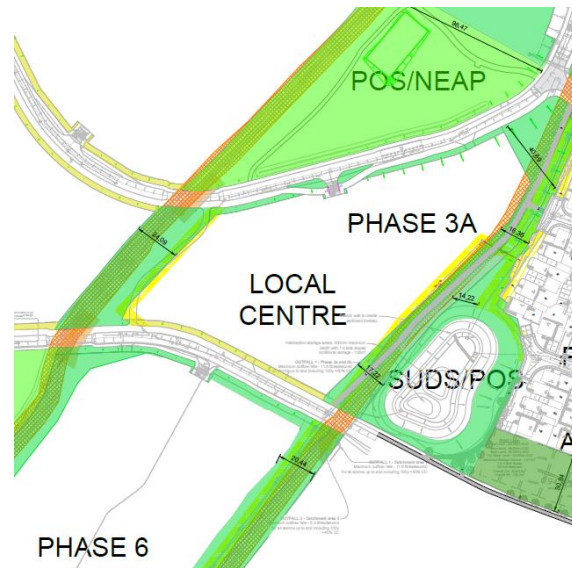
Plan showing POS surrounding Phase 3a and the Local Centre.
